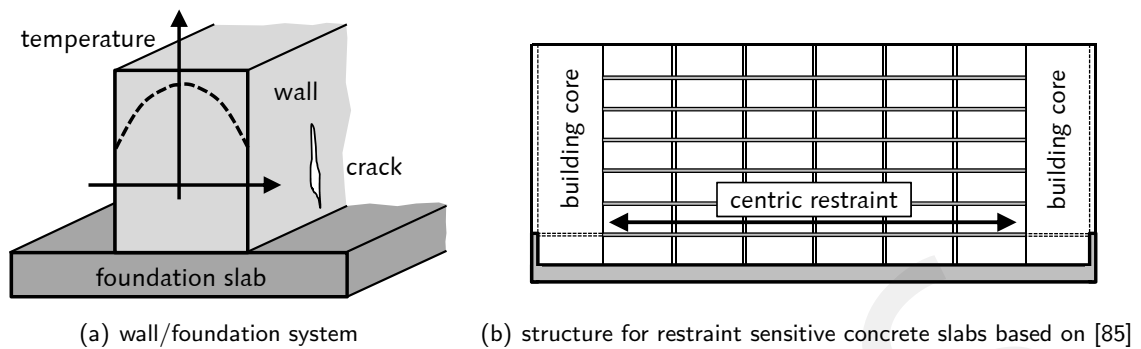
Sensitive restraints on concrete wall/foundation and slab system
